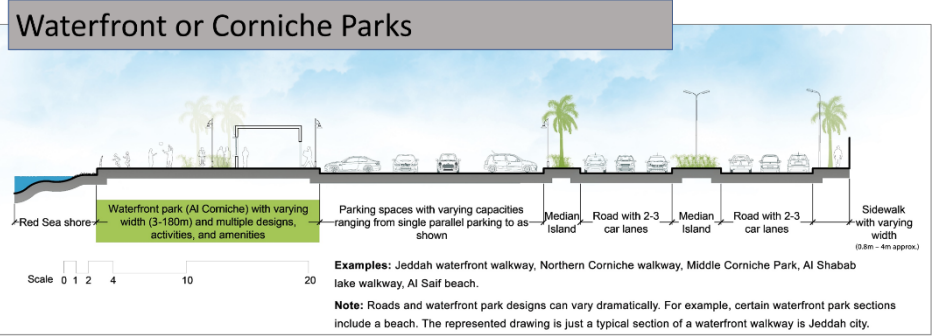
Typical Sections of Jeddah's walkways/LP types (by author).
